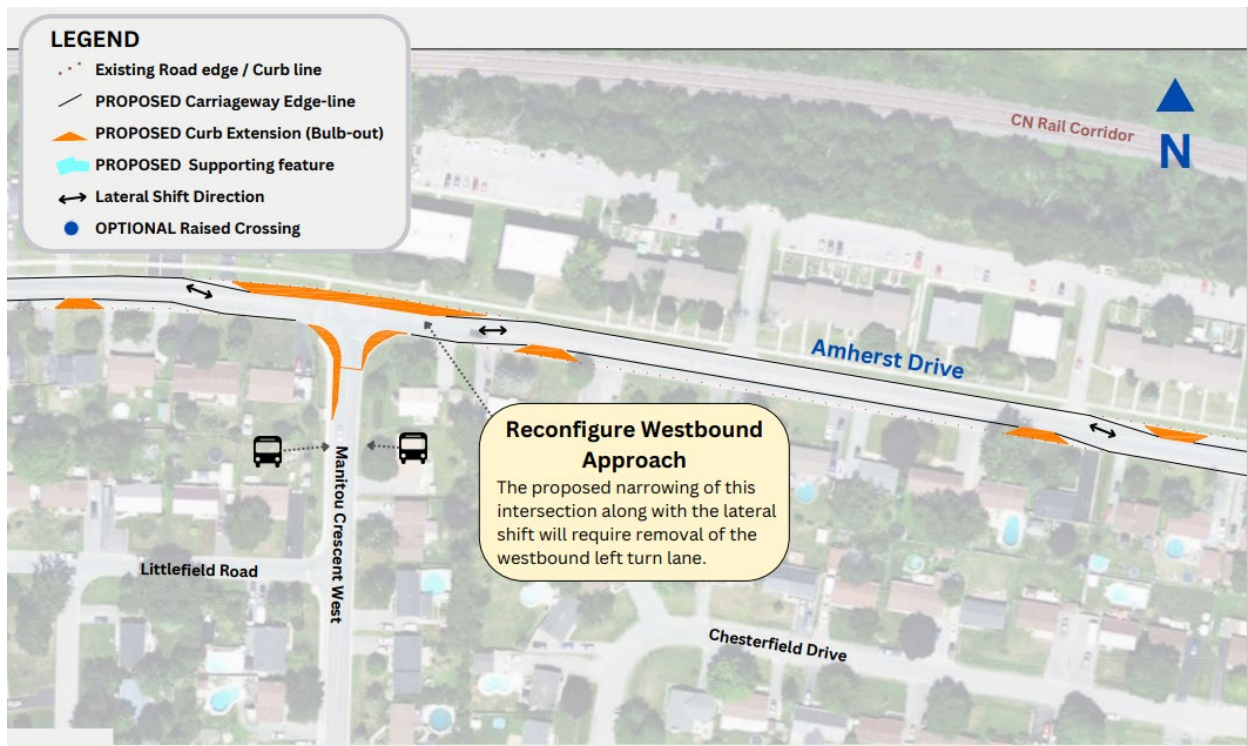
A concept drawing showing how lateral shifting could be applied to Amherst Drive
